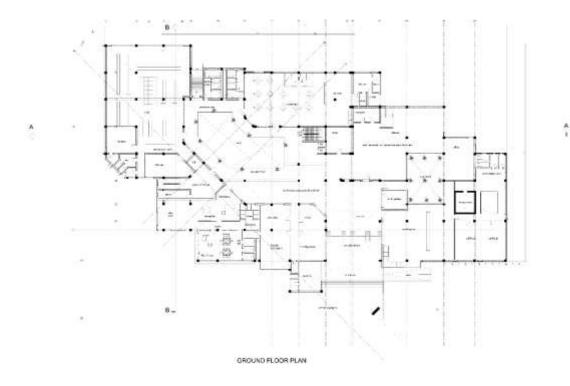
Proposed ground floor plan for office complex Source: Authors' design (2020)
